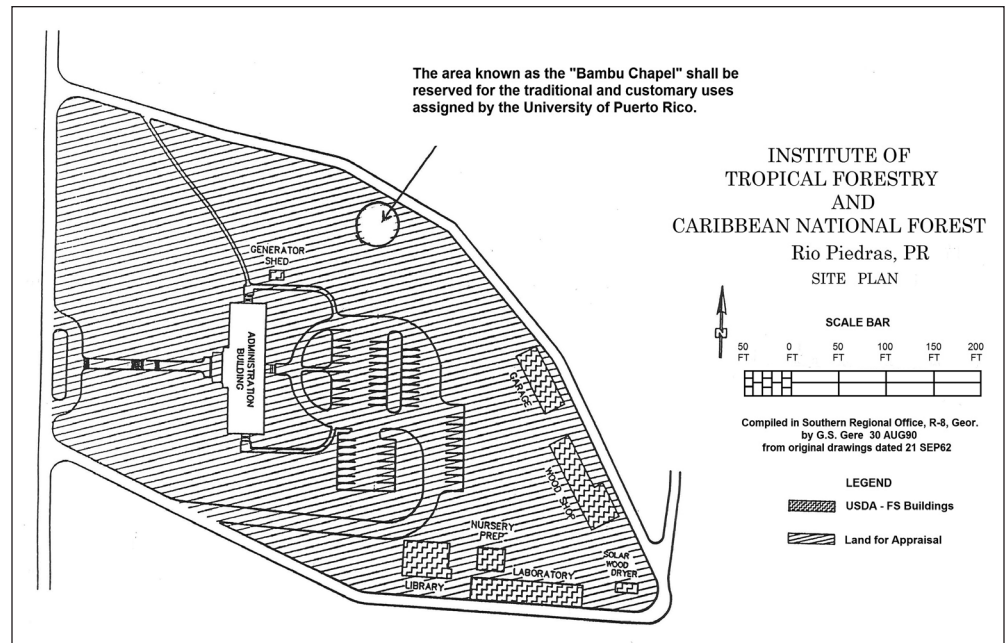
Spatial distribution of building facilities at the headquarters of the International Institute of Tropical Forestry before the buildings were rehabilitated or replaced.
